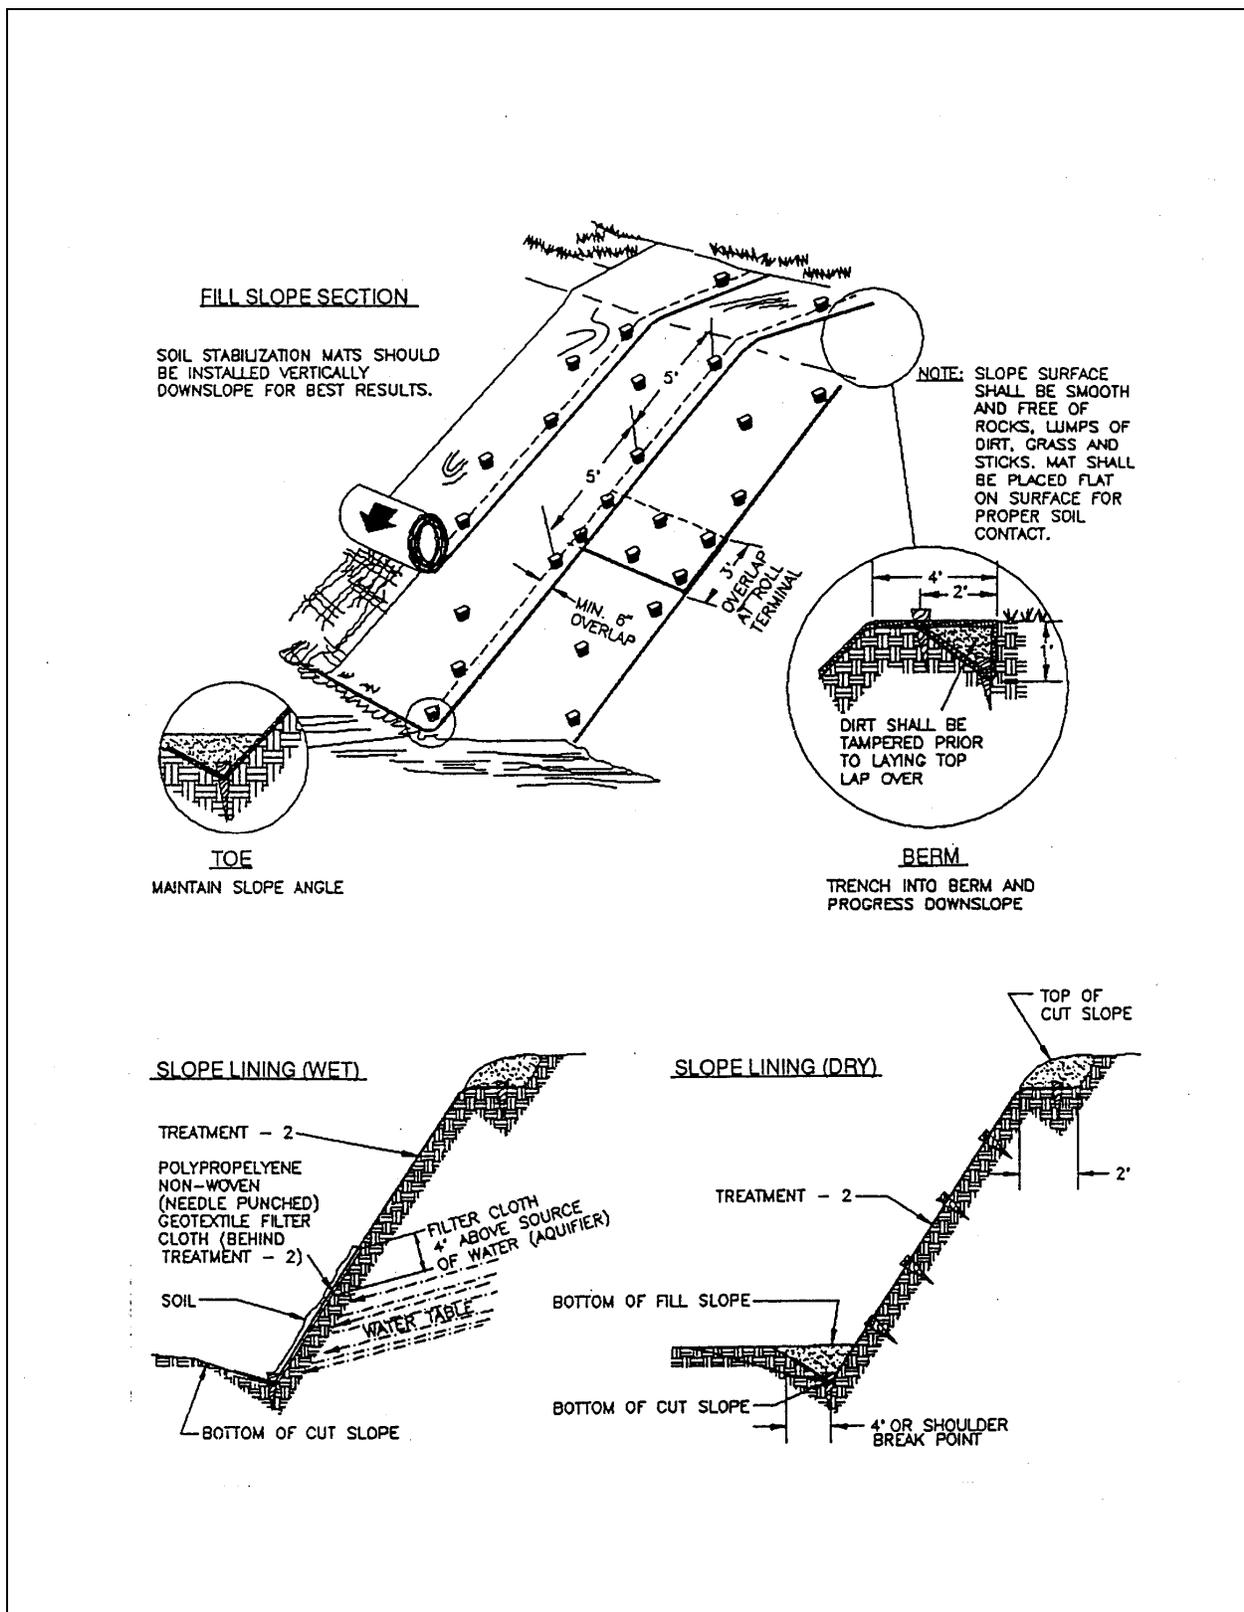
Typical Treatment 2 - Soil Stabilization Matting Slope Installation
